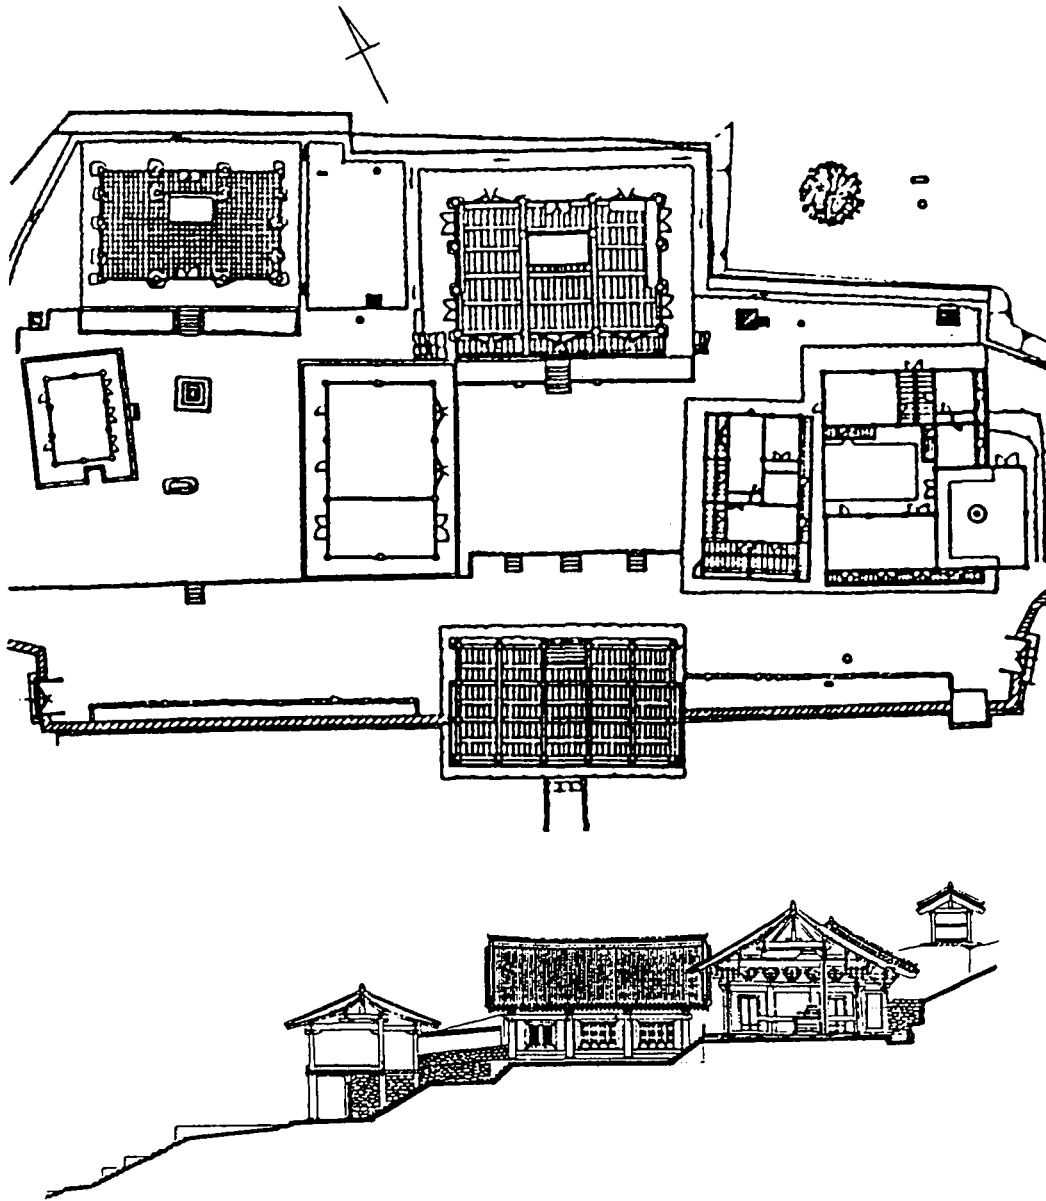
Layout plan and section of Bong-chong-sa 鳳停寺 봉정사 (No. 7.8.1.)
